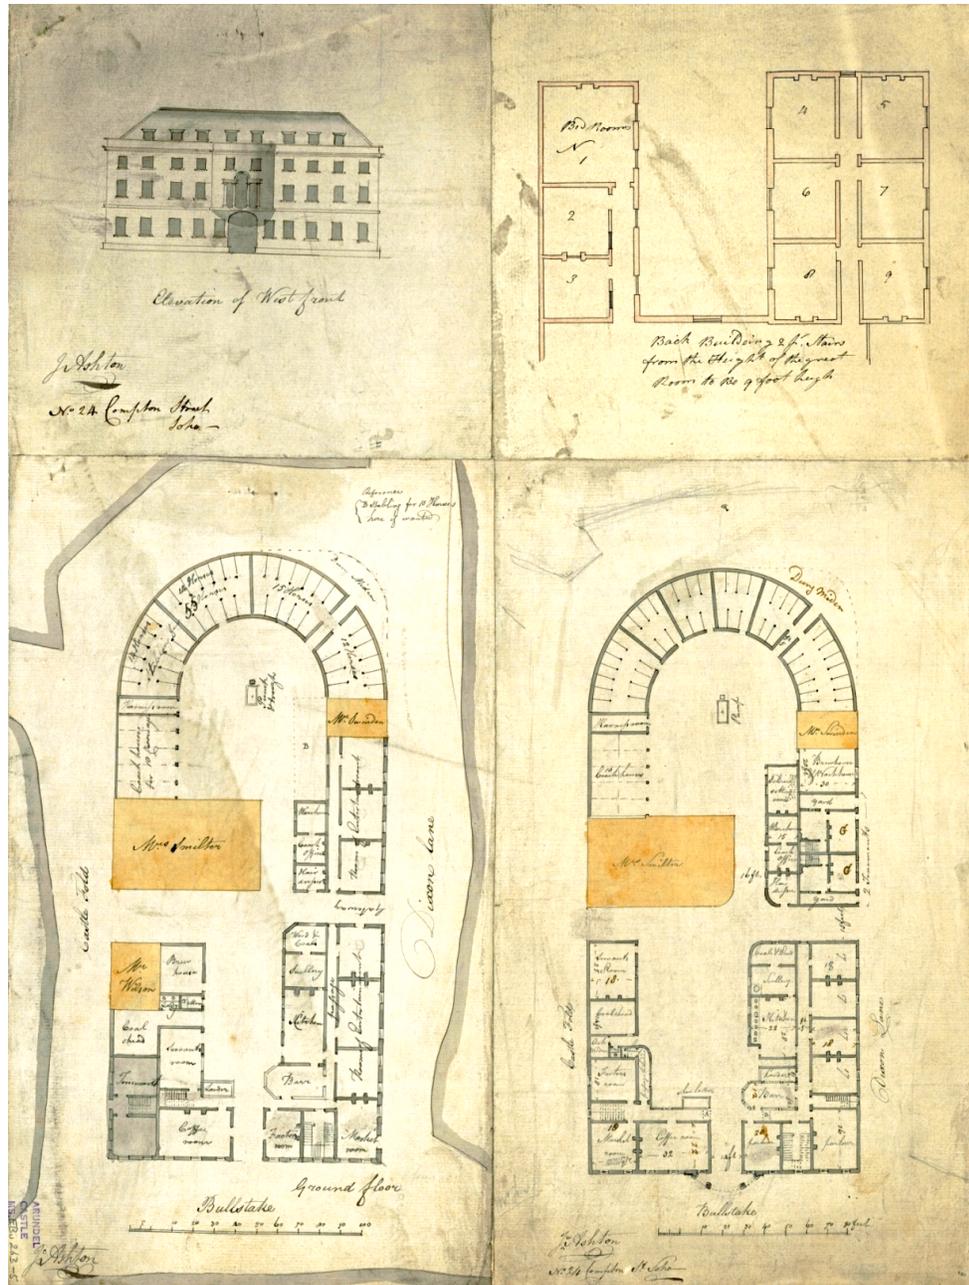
Plans adopted for the building of the Tontine Inn Sheffield, Sheffield Archive: Arundel Castle MS EBU 253-5,s.
